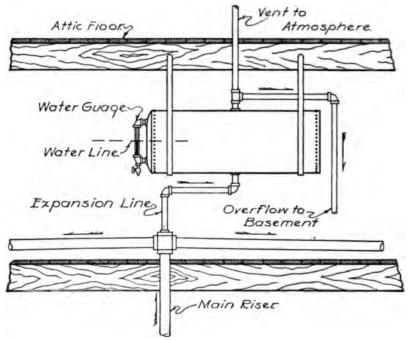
Expansion Tank Connection—Horizontal for Overhead System.
